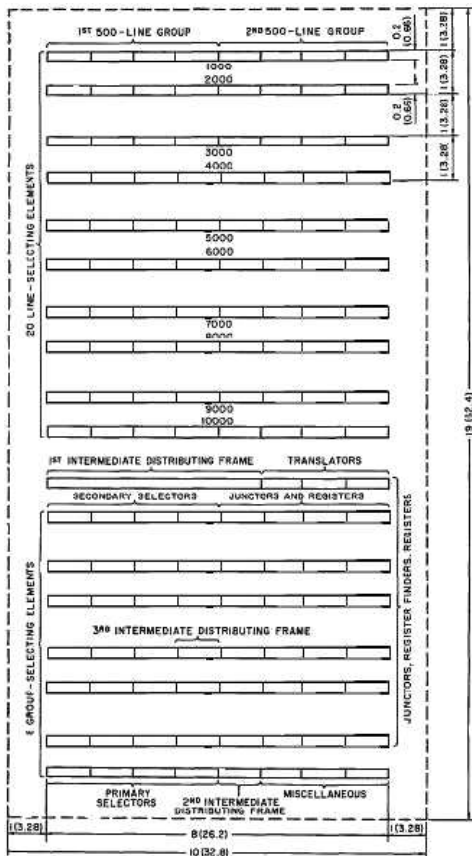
Topical layout of a 10,000-line exchange switch room. All bays are 3.65 meters (11.3 feet) high and minimum ceiling clearance should be 3.9 meters (12.7 feet). Other dimensions are given in meters (feet).
